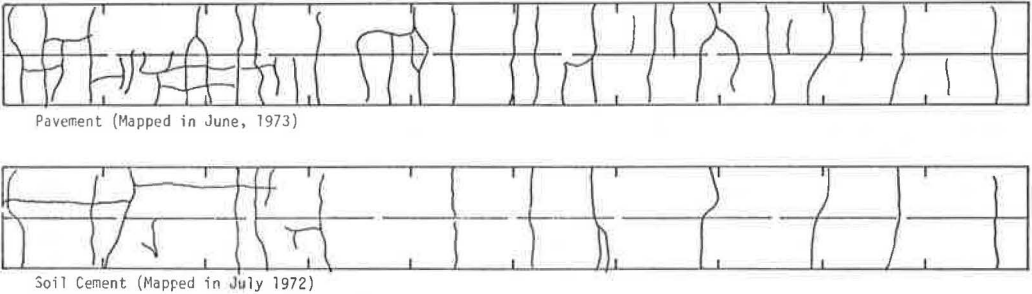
Cracking pattern of soil-cement base and superimposed pavement for experimental section with sugar additive.
